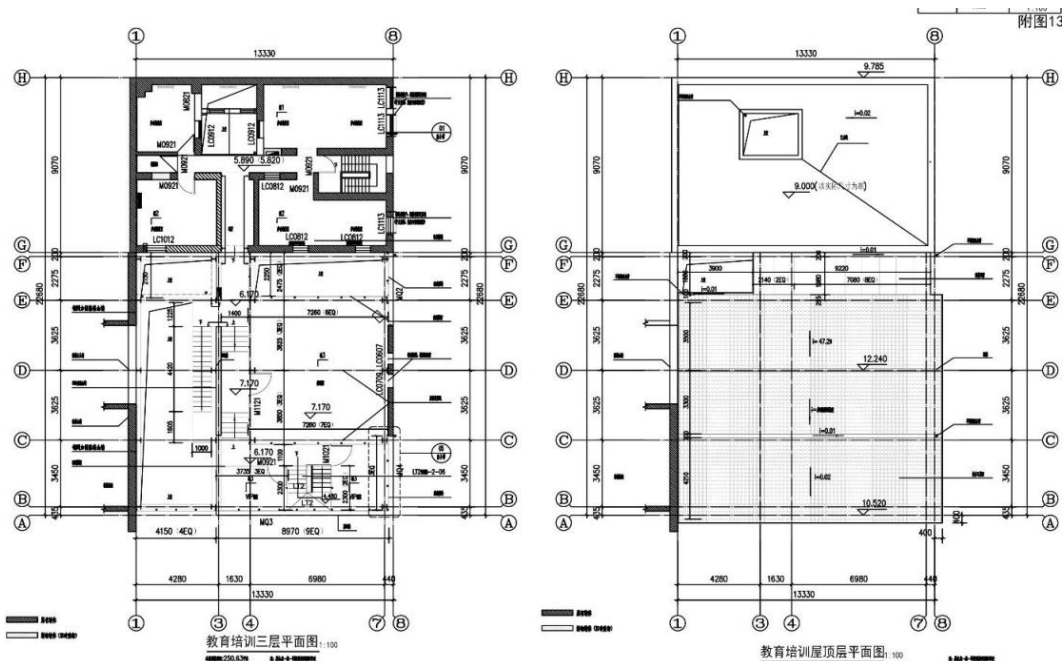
The third floor and roof plan of No. 3-5 Yongqing Street (Source: Nansha Original Architecture Studio)
